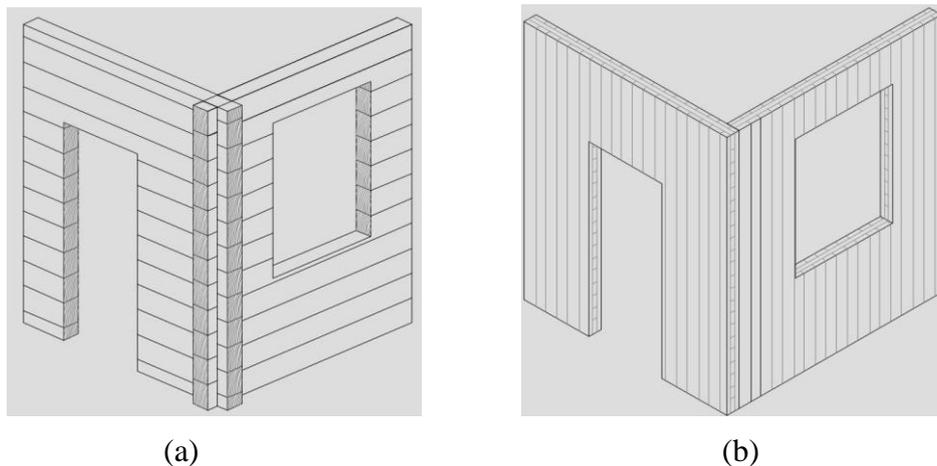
Massive timber construction systems; (a) Block house; (b) CLT structure.
